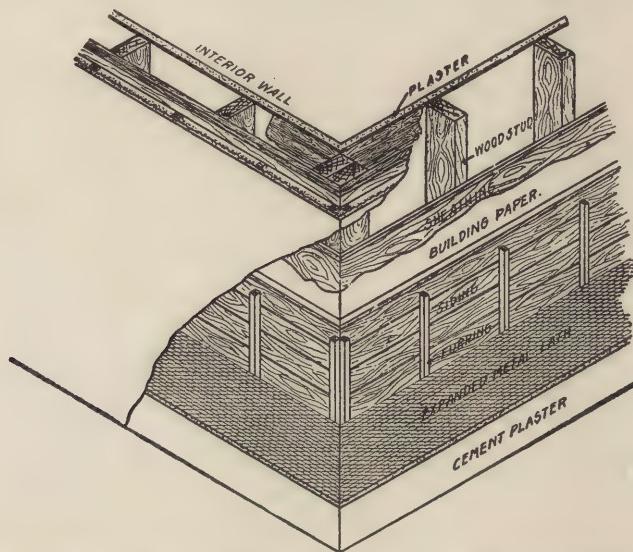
Detail of Construction at Corner—Cement Plaster "Overcoating."
